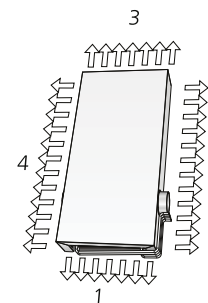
Top view of nozzle setting for a Parasol EX double-module unit, sides 1-4.
